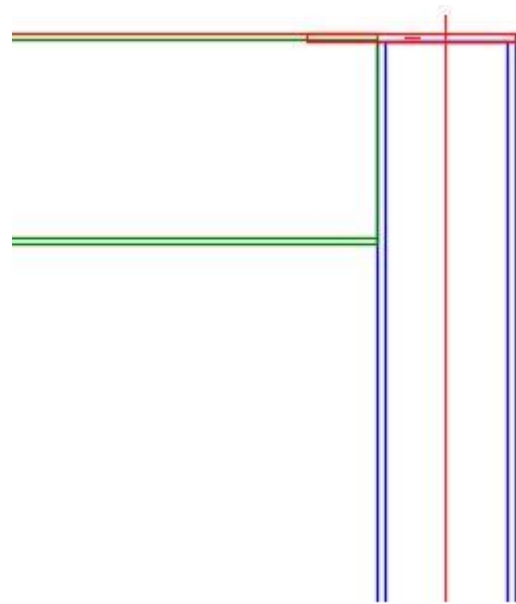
Elevation of Column, Beam & Plate in 2D wireframe
